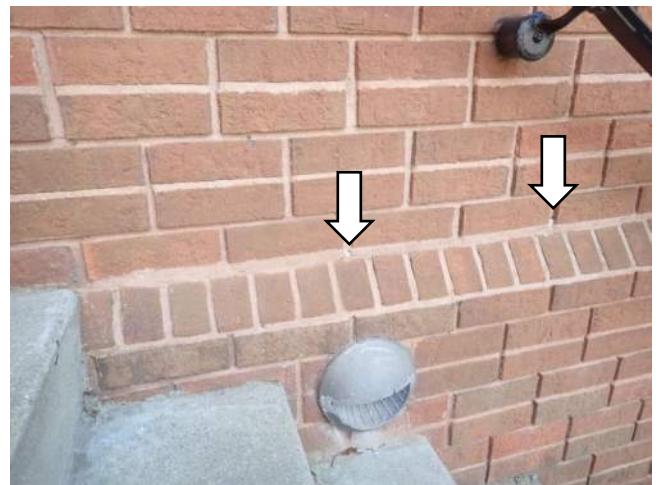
1990s era construction is a veneer assembly with weep ropes and concealed flashings at ledges.
